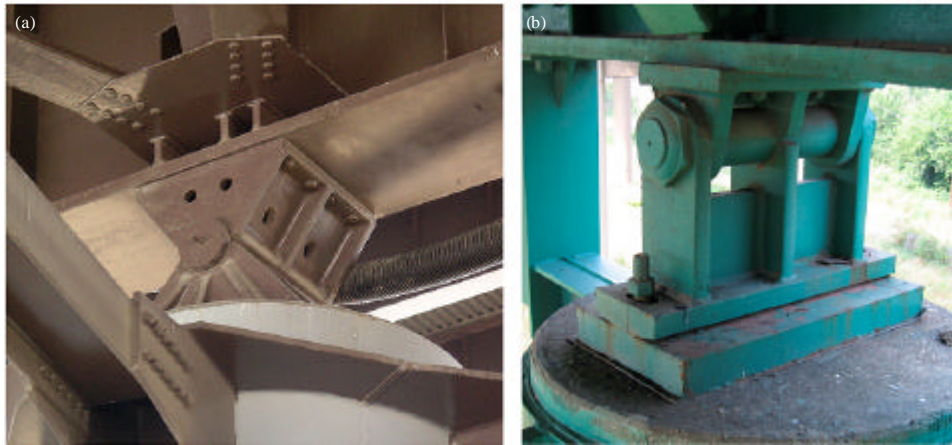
(a-b): (a) Fixed bearing and (b) Rocker bearing (Padgett, 2007)
